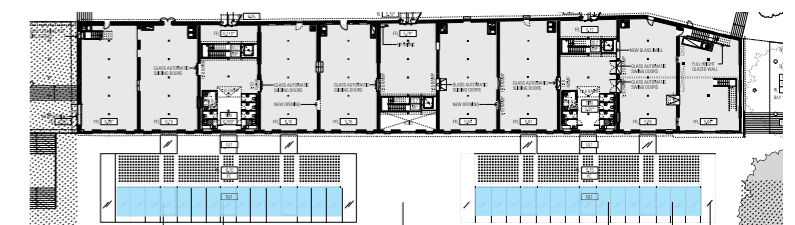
Plan of awnings, highlighting the extent of sun-shading blinds.
